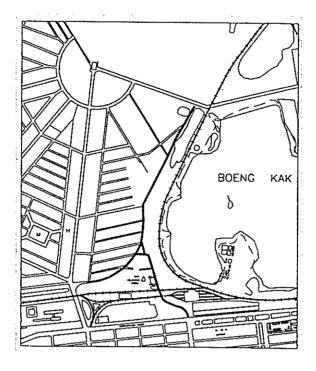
Shortcut between Preah Monivong Blvd and Inner Ring Road
